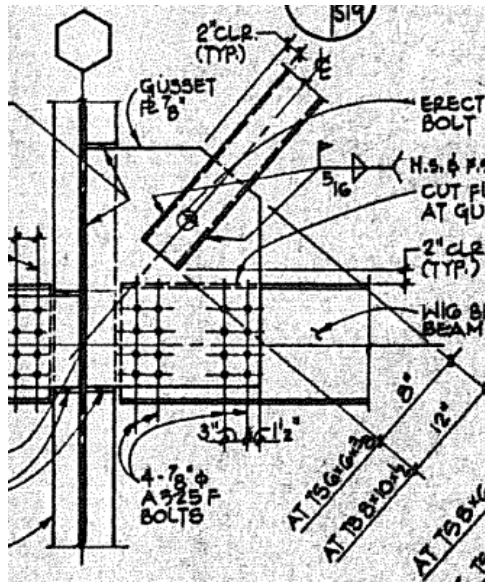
Bottom Connection Detail (88CA3A--1-CD-2)
